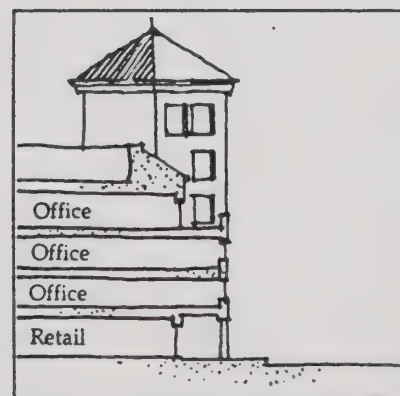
Place a landmark tower element at the corner of Hill and D Street.
